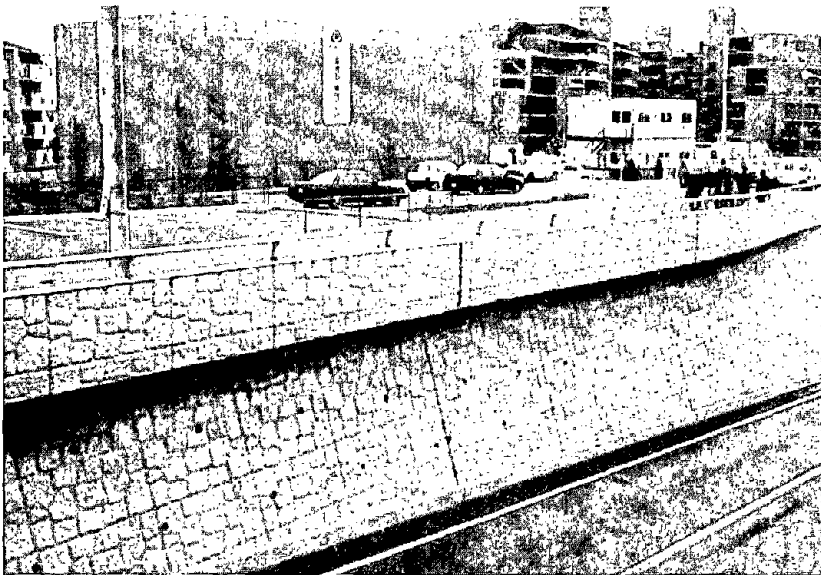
Undamaged reinforced earth wall supporting a roadway in Ashiya.
